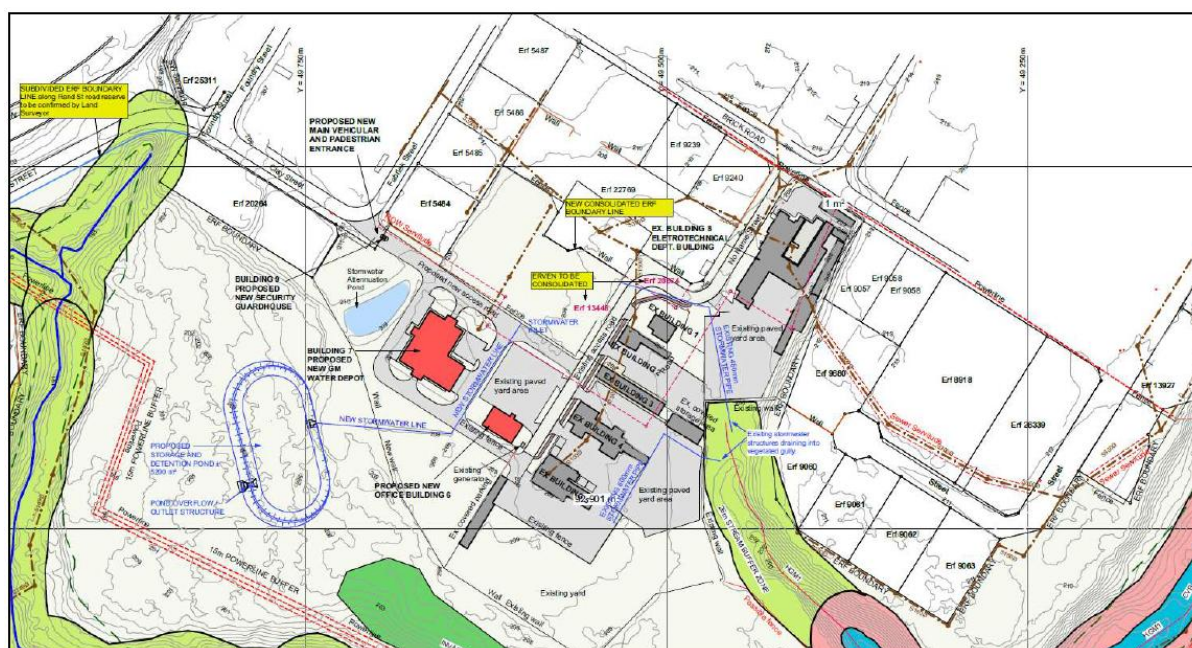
Site development plan showing the proposed new buildings in red and the proposed stormwater storage and detention pond.
